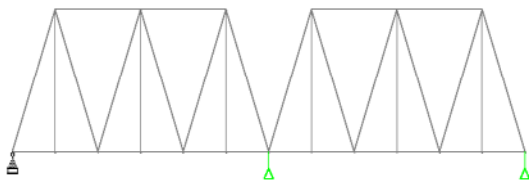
Elevation view of proposed bridge (Phyoe and Htat 2014)
